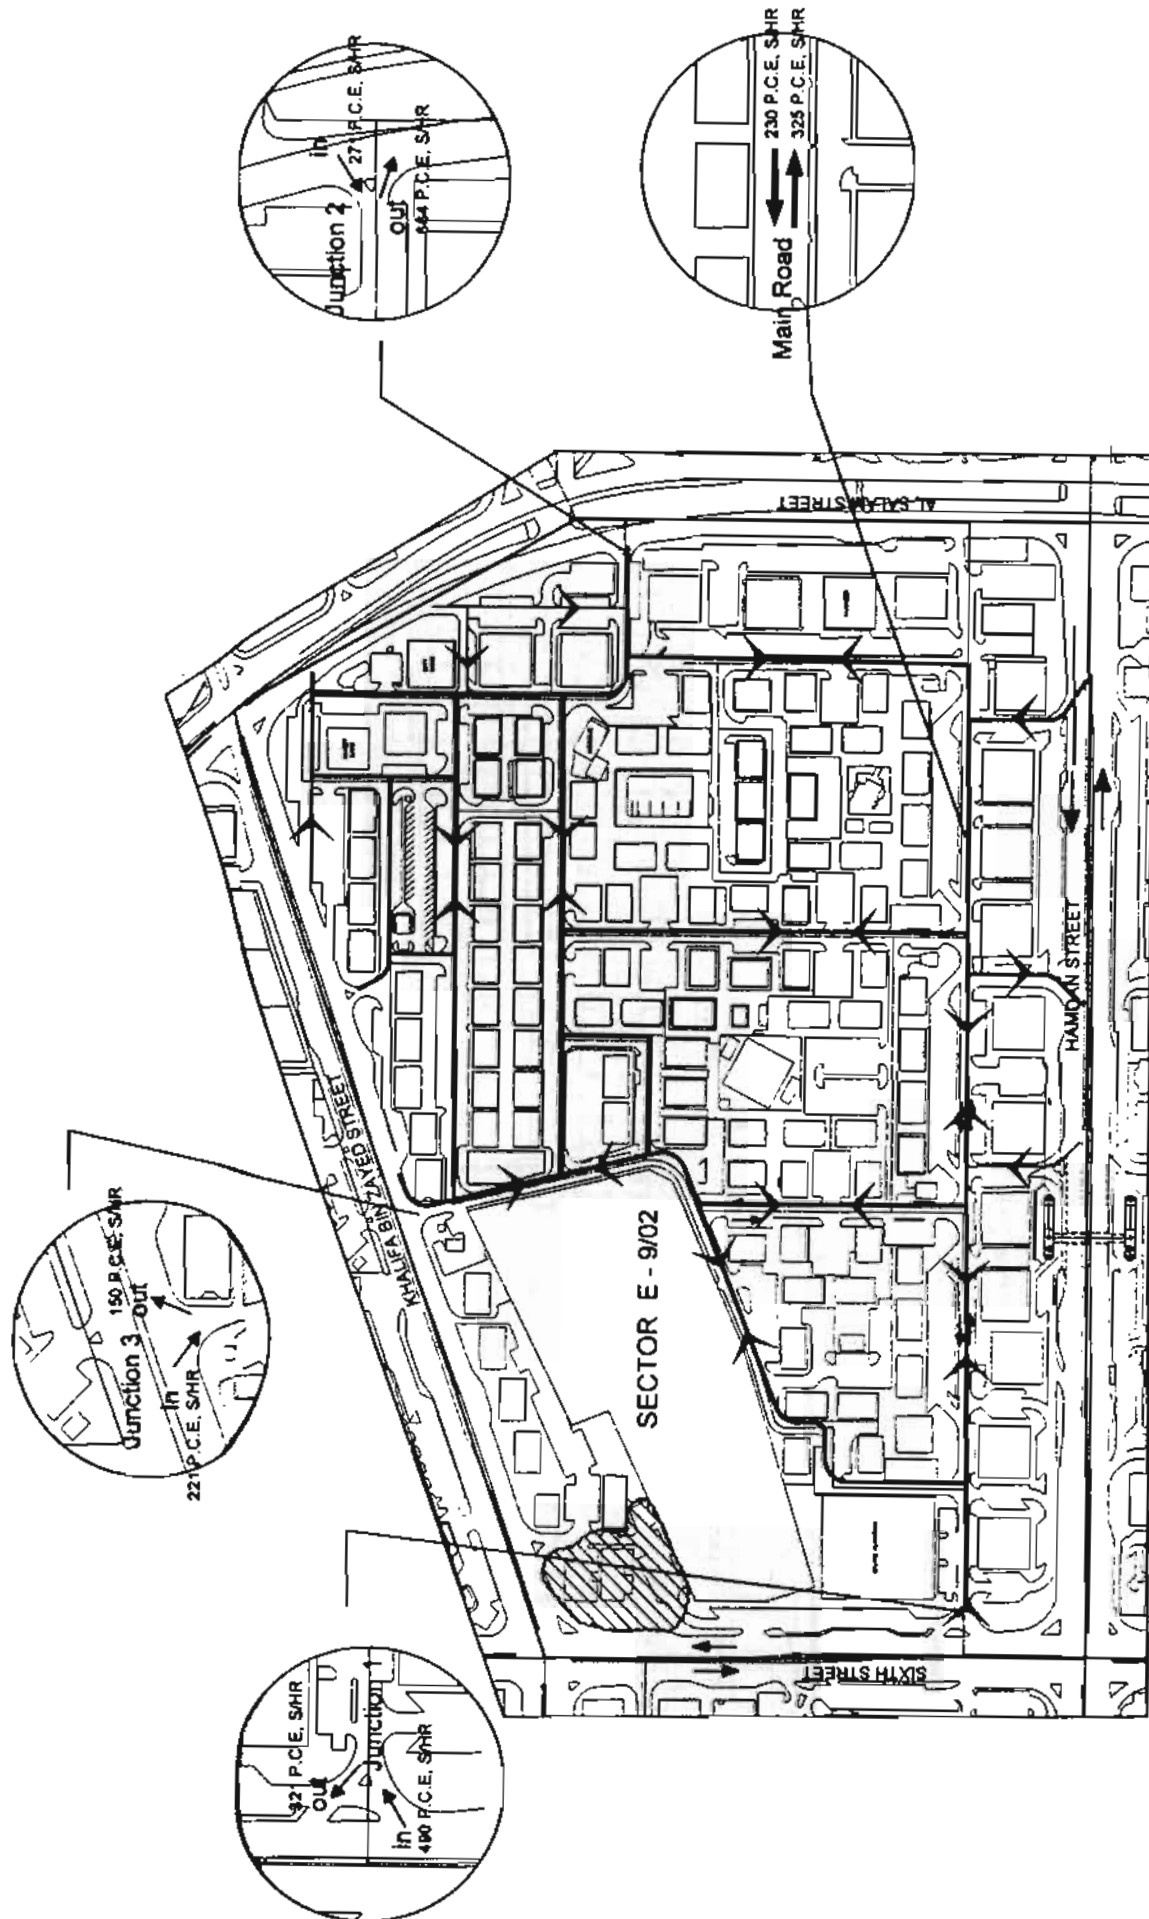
Existing Geometrical Plan Of Sector E-9/02
